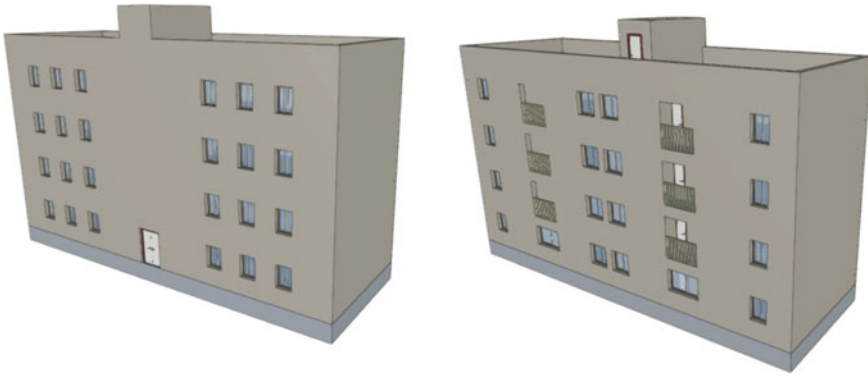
Building modelled in the CYPE Architecture tool. Design and 3D modelling of buildings (CYPE Ingenieros, S.A. Software para Arquitectura, Ingeniería y Construcción 2021c)
